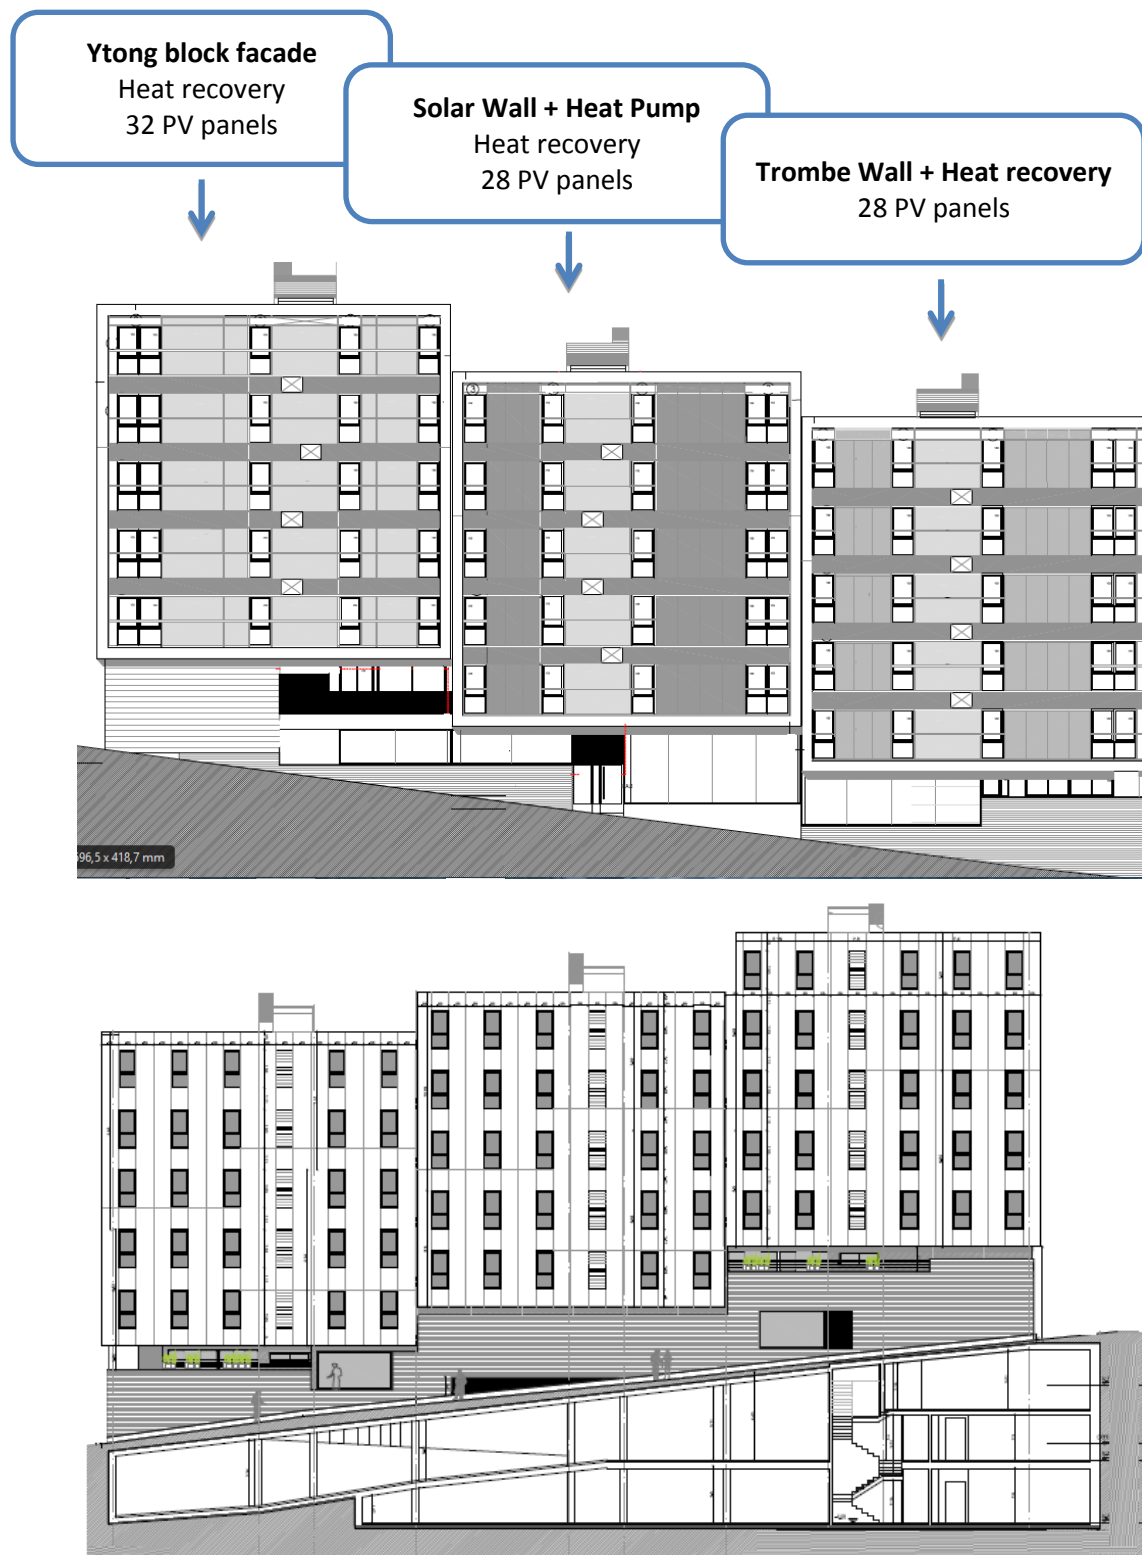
Building south facade and high performance solution deployment (above), and north facade (below)
